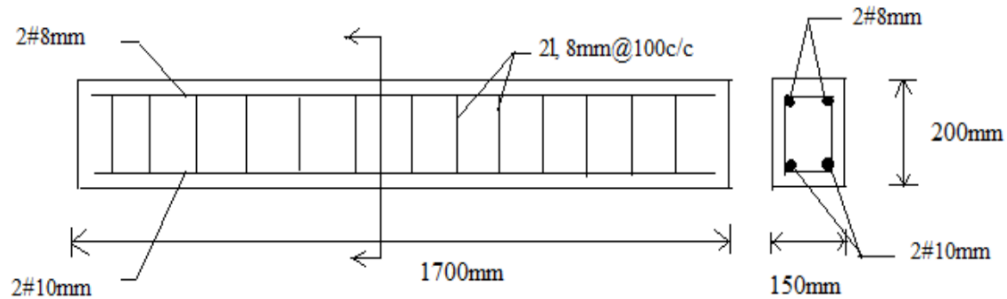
REINFORCEMENT DETAILS OF TEST BEAM-1, 2, 3 & 4
